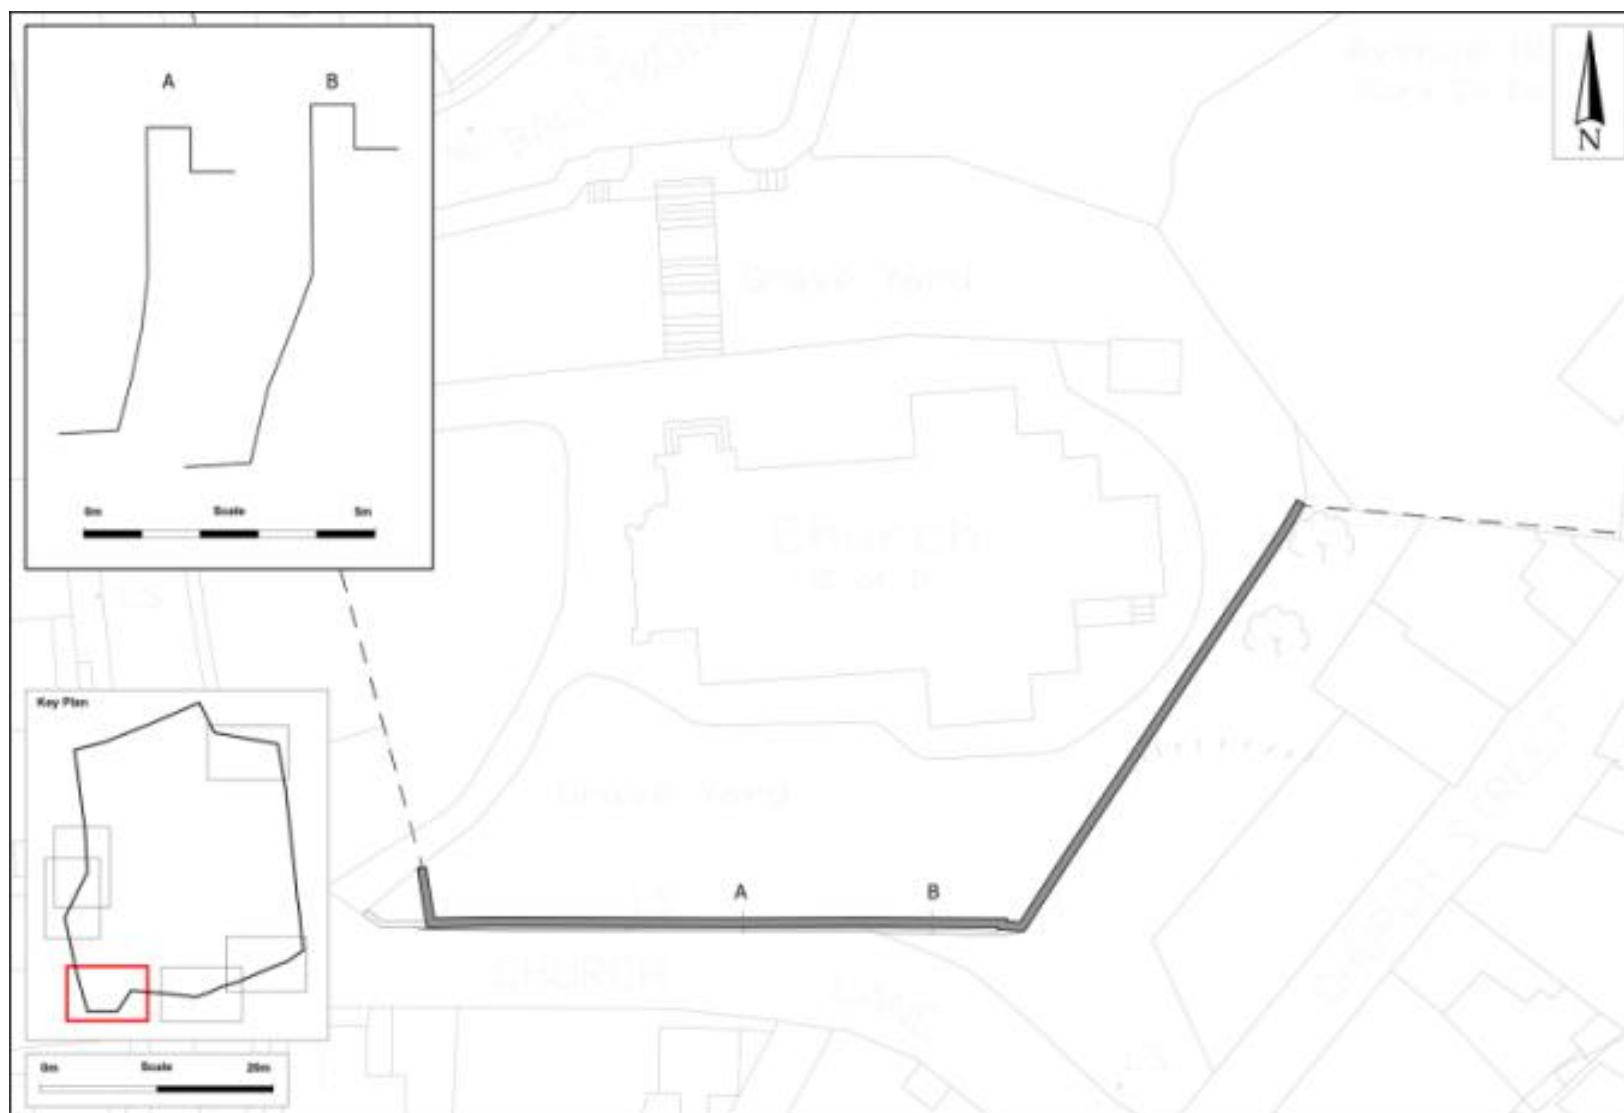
Section 5 showing instrument survey of walls and sectional profile across wall with base batter.
